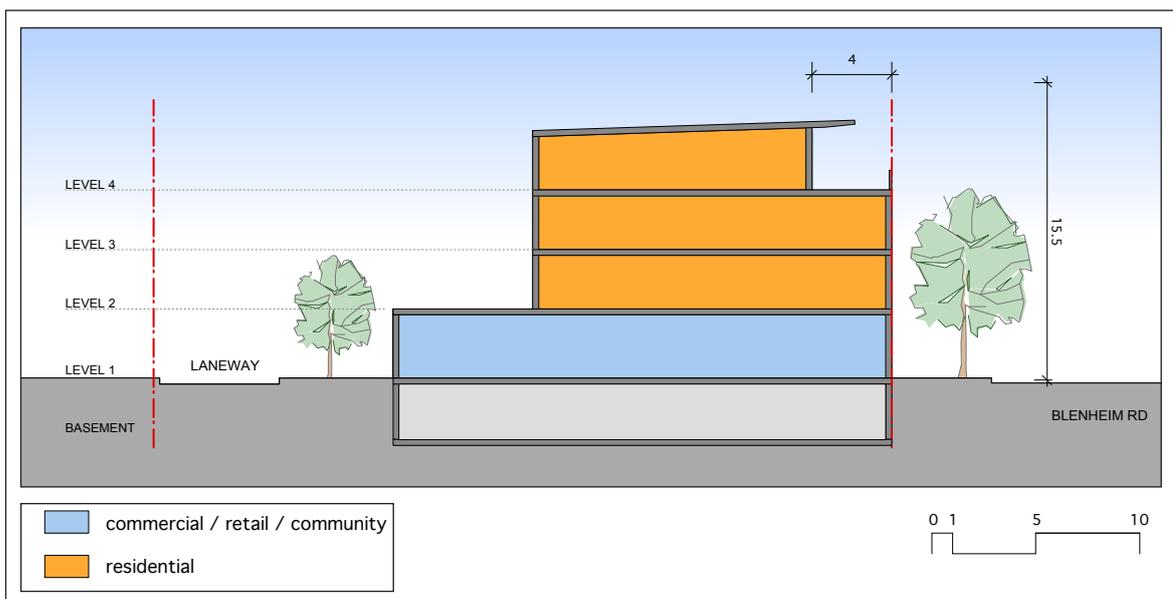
Blenheim Road Small Centre Building Height Control - Cross Section
